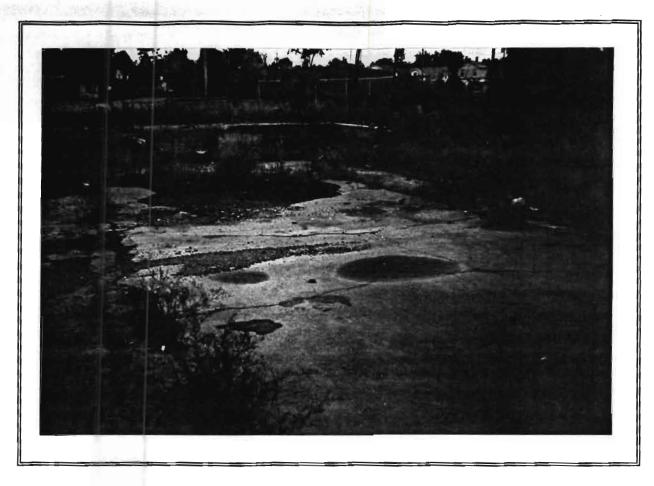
Former pit filled with concrete located along south side of warehouse building in the vicinity of the former neutralizing room (potential stained surface shown in background).
